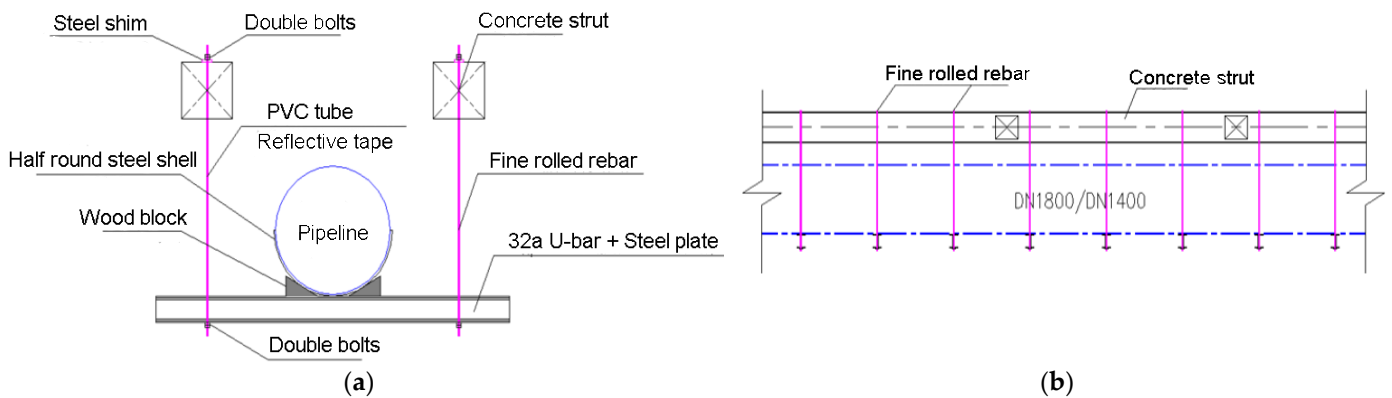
Schematic diagram of the pipeline suspension structure: (a) Transverse section; (b) Longitudinal section.
